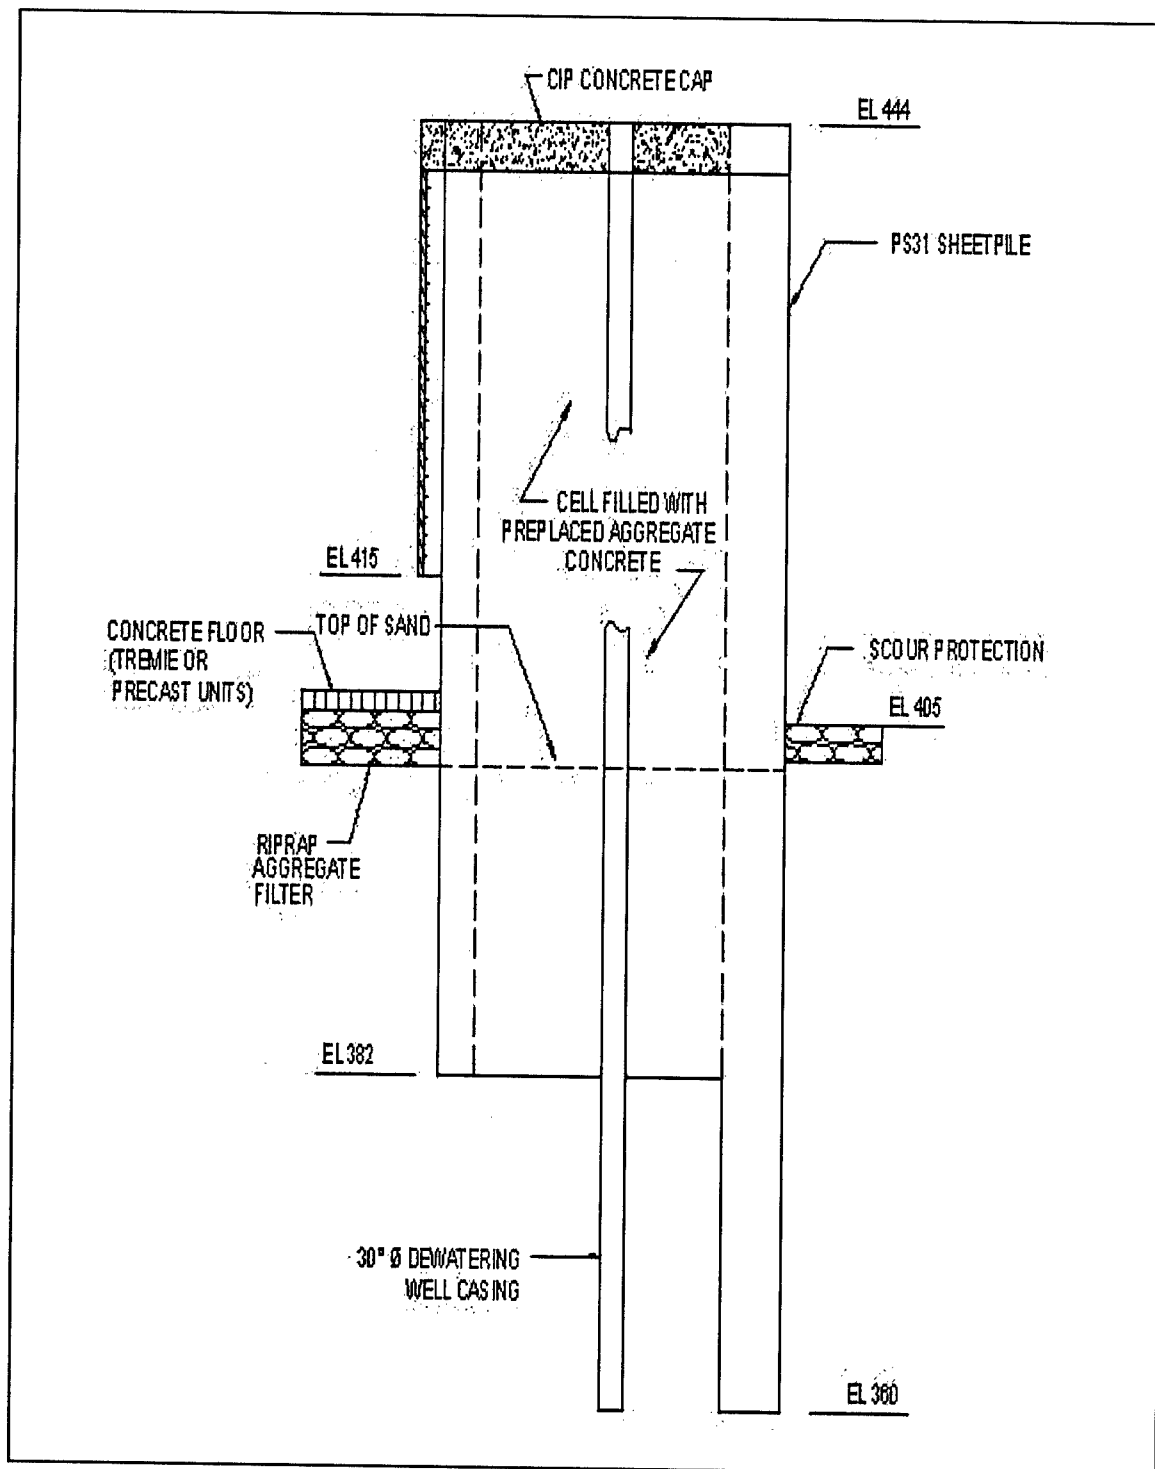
Plan 1, sheet-pile cellular wall used to extend 600-ft lock
